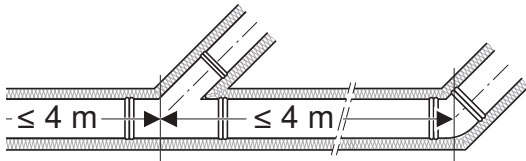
Reduced branch fitting 45°, pipe length ≤ 4 m
